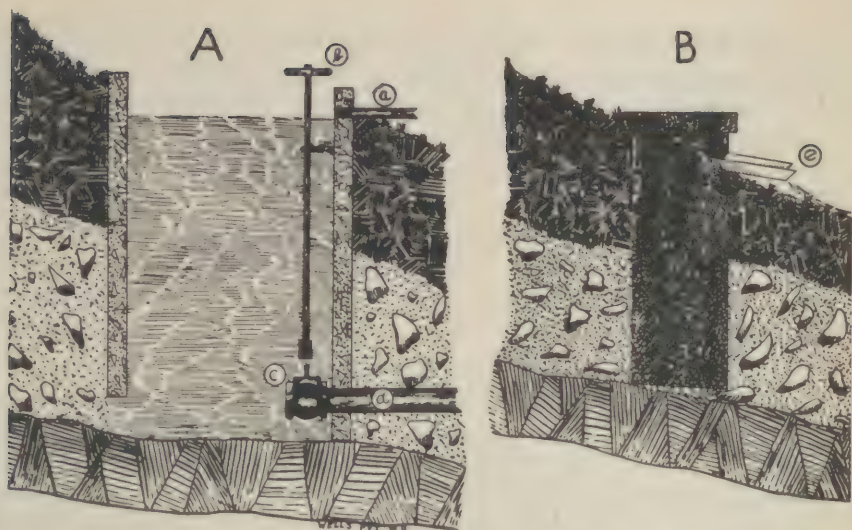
Protected springs (Schematic). A—Concrete basin. B—Tile reservoir. a—Overflow pipe. b—Valve stem. c—Valve. d—Outlet. e—Outlet.
